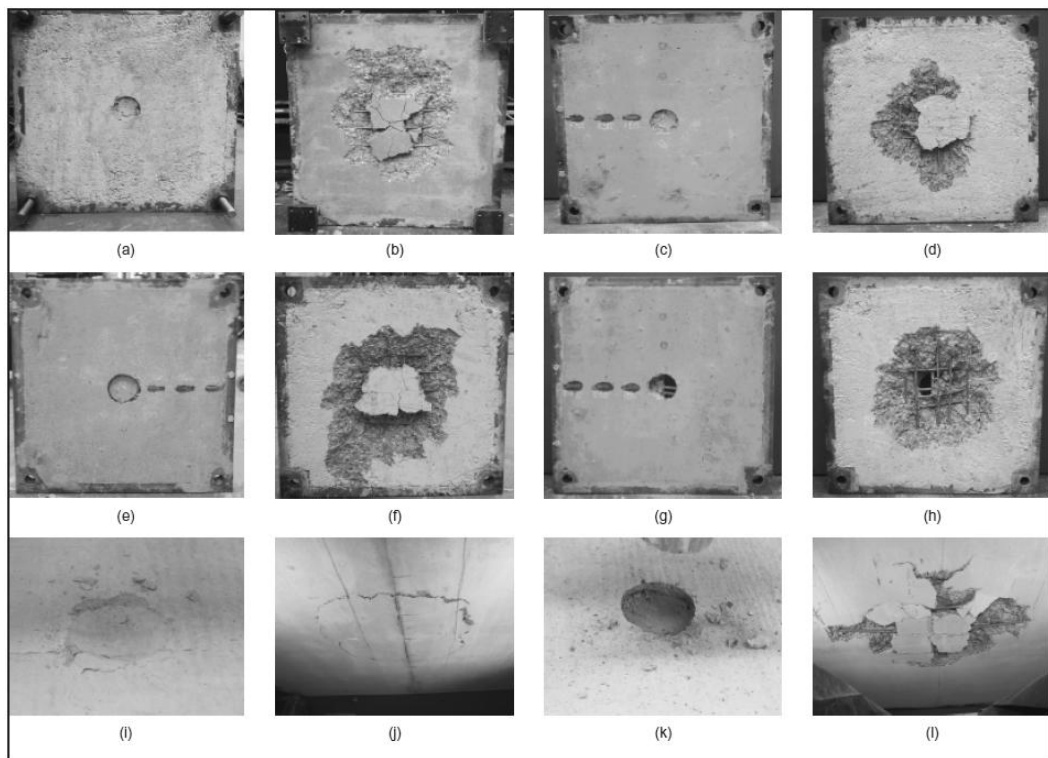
Slab faces after impact: a) top face of slab 1; b)bottom face of slab 1; c) top face of slab 2; d)bottom face of slab 2; e) top face of slab 3; f) bottom face of slab 3; g) top face of slab 4; h) bottom face of slab 4; i) top face of slab 5; j) bottom face of slab 5; k) top face of slab 6; l) bottom face of slab6 (Source: Chen and May, 2009)
